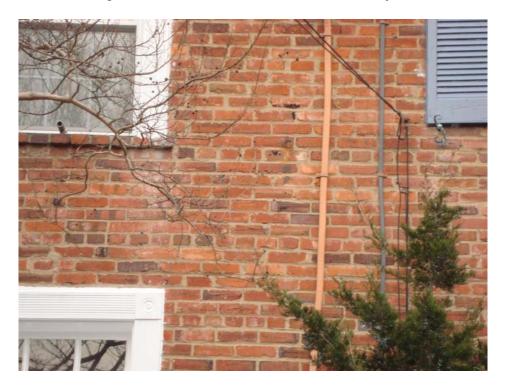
View of Existing Elevation's "Common Bond" Brickwork
